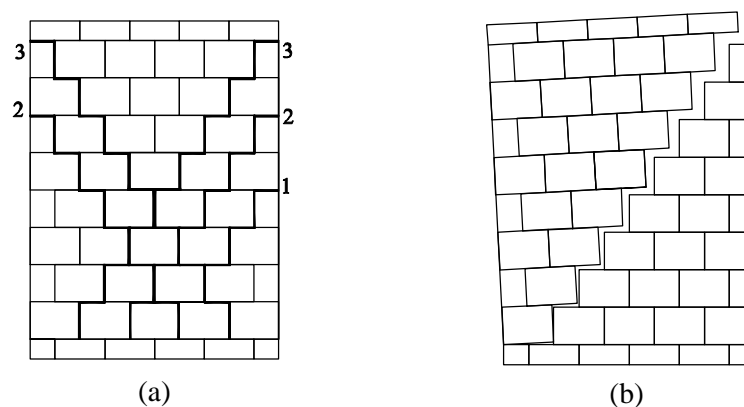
Deformation patterns of dry stone masonry walls; (a) location and opening of flexural cracks by order; (b) diagonal crack and final rocking mechanism
